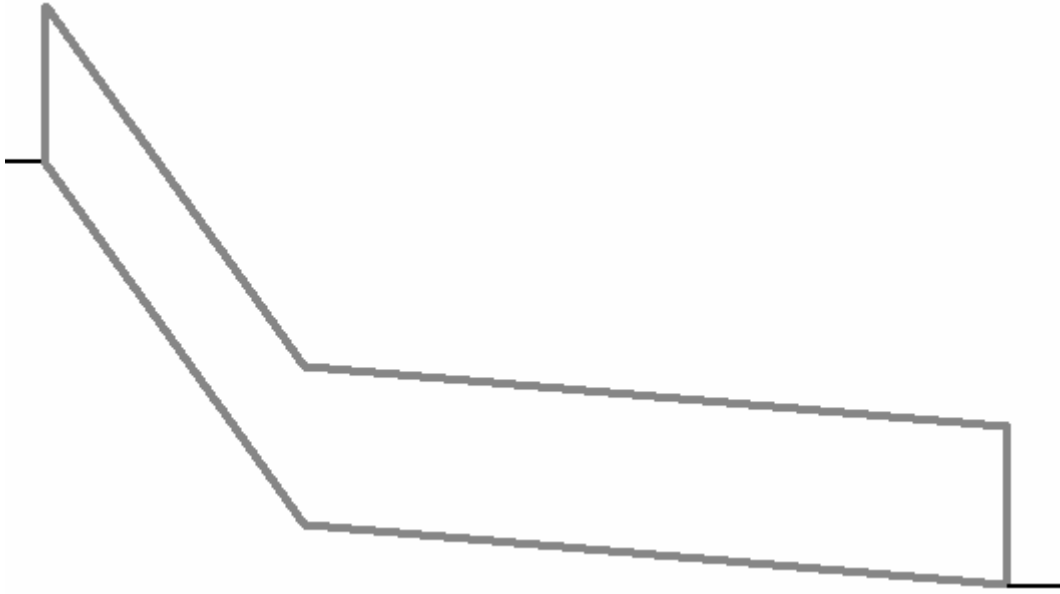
Generic shape of a single broken-back culvert in elevation view. Flow would be from left to right.
